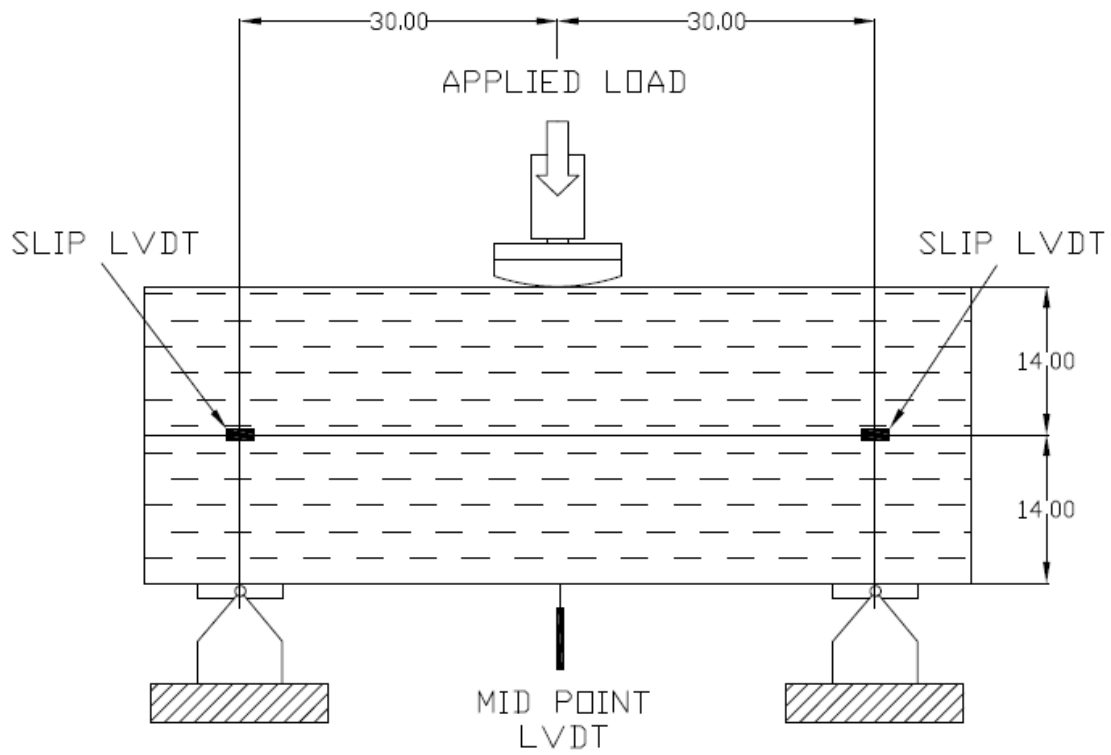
Test setup for Phase 1: Depth Series. Drawing shows two stacked 14" deep members. Dimensions in inches.
